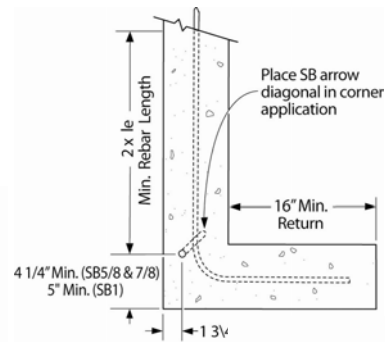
SB ANCHOR BOLT INSTALLATION—CORNER OF STEM WALL
